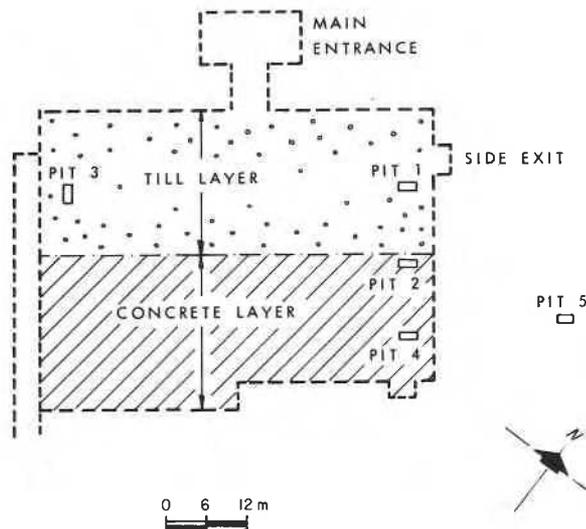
Floor plan of one-storey building showing areas of foundation covered by till and concrete protection slab and location of test pits.
